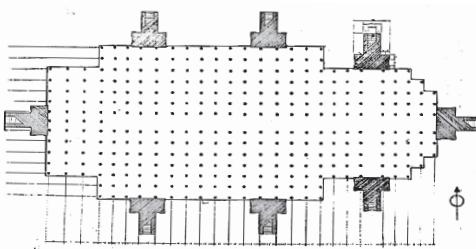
Plan of Pakhanne Kyaung^{*19}
